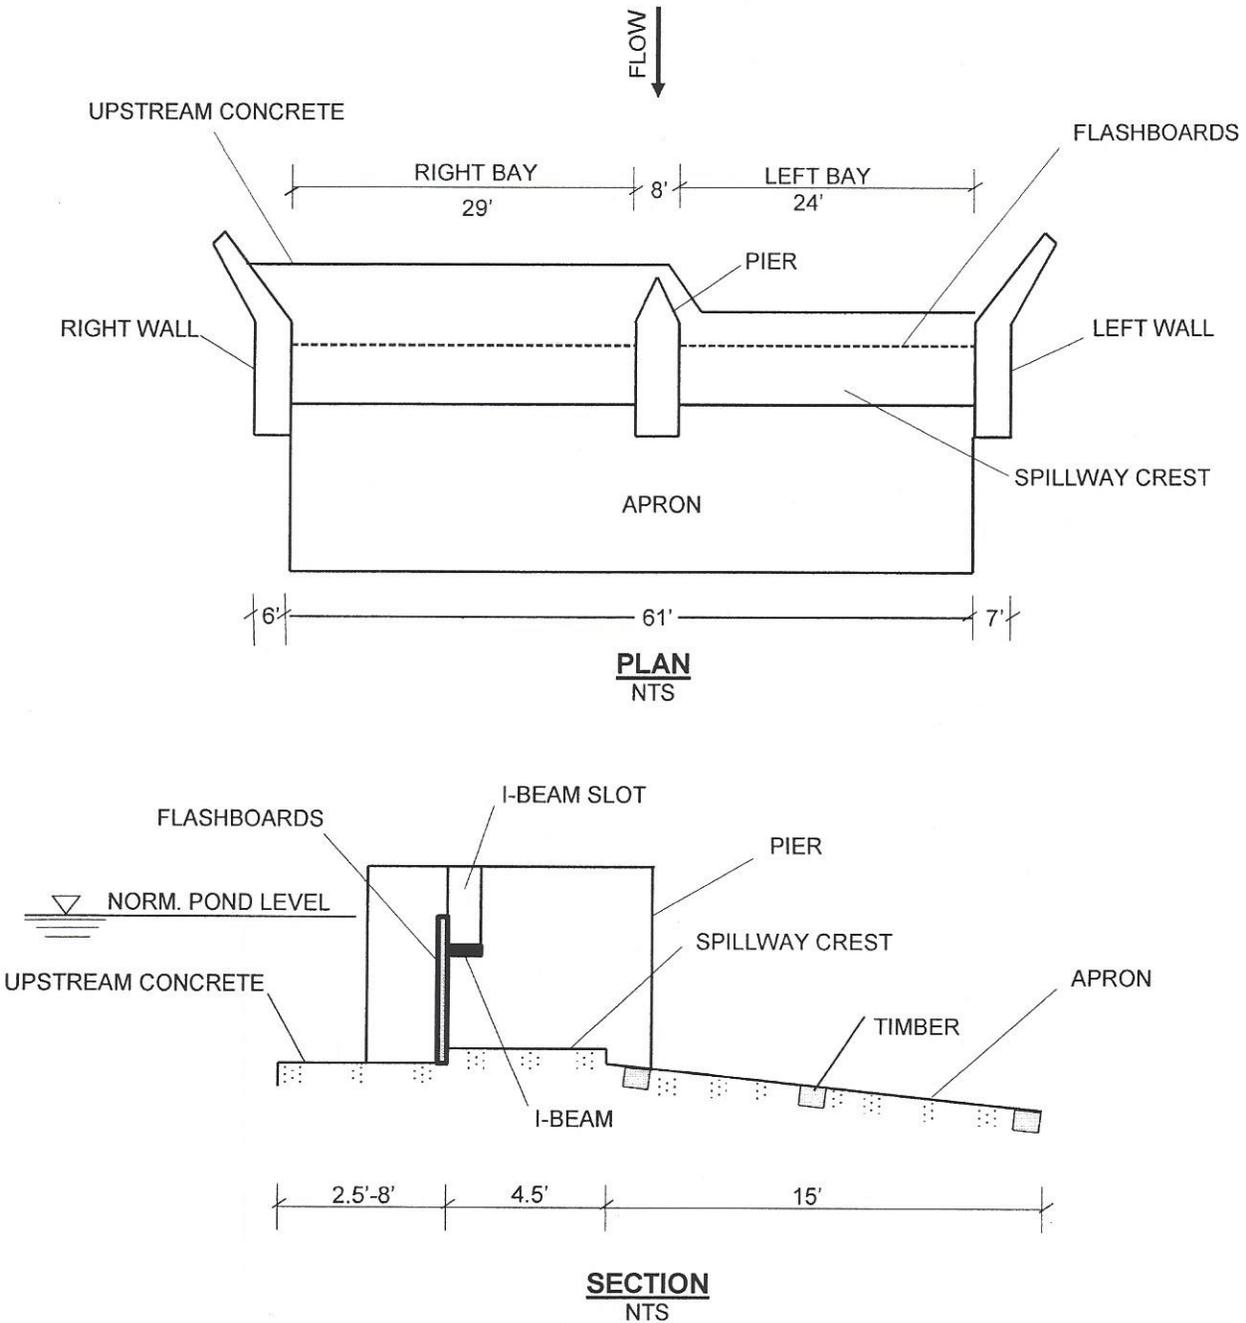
PISECO LAKE OUTLET DAM: PLAN AND SECTION
